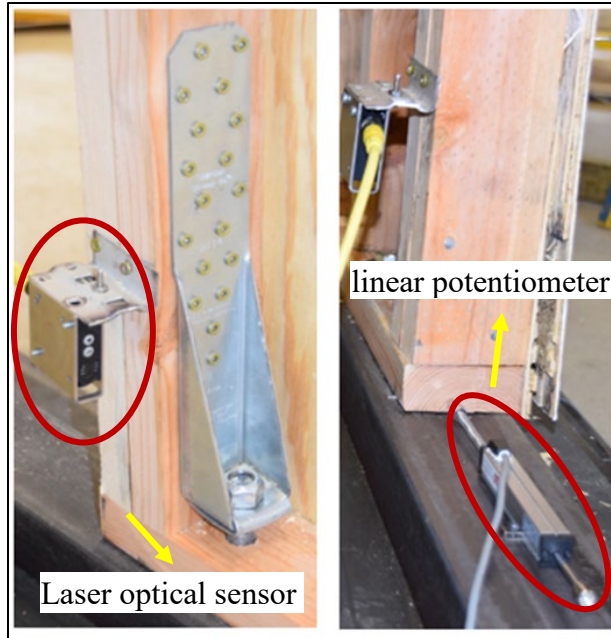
Optical Sensors mounted on terminal studs. Simpson Strong Tie and a 3/4 "anchor bolt (this bolt engages the load cell underneath the wall and inside the tube)
